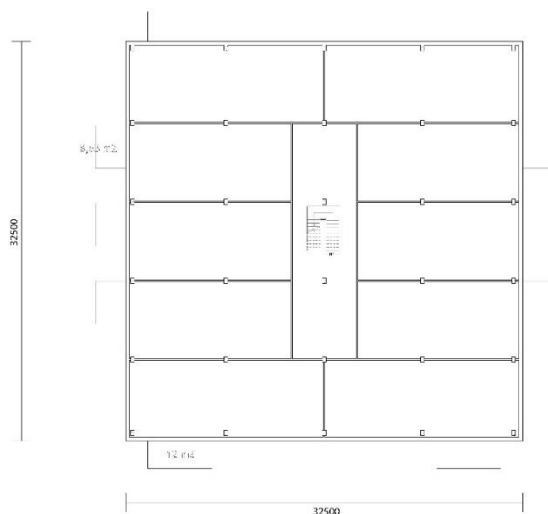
Floor plan 1st, 2nd and 3rd floor prototype(Own work, 2024)
